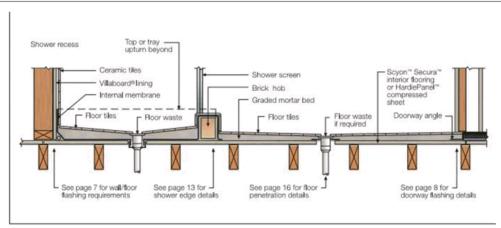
TYPICAL BATHROOM CROSS-SECTION
